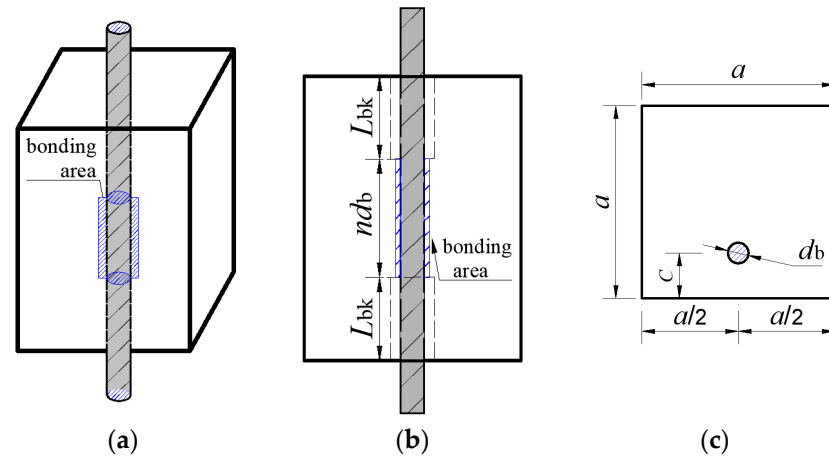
Schematic diagram for specimens in pull-out test. (a) Three-dimensional diagram. (b) Vertical section. (c) Cross-section.
